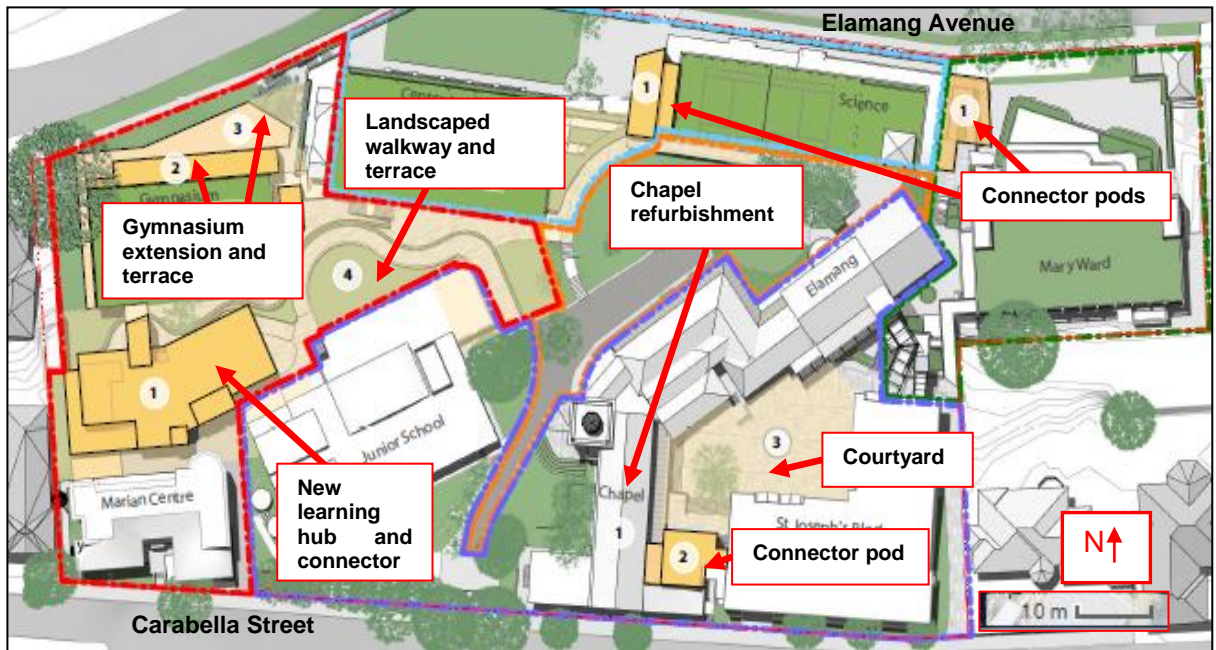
Proposed works Stages 1.1 (red dotted outline) and 1.2 (remaining area of the site) work zones (Source: Applicant's EIS)
